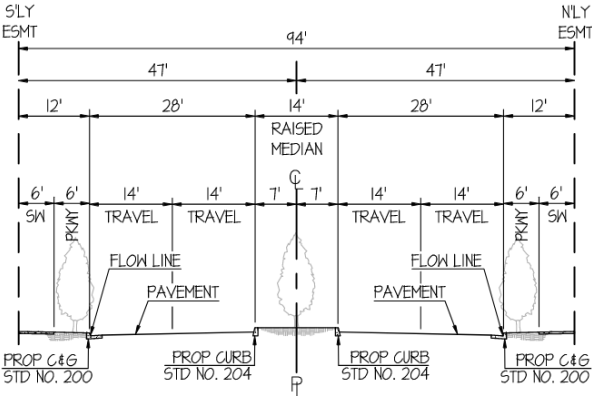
, Standard Street Sections – Modified Collector (Harvest Landing Way)
